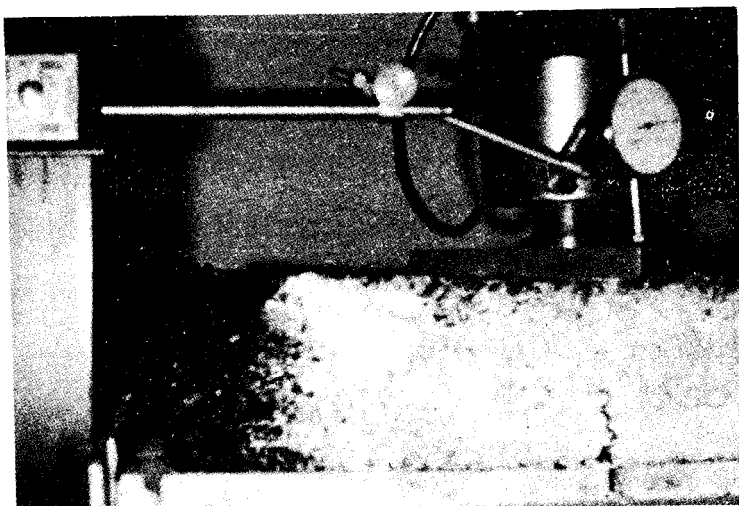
Reflection crack unreinforced asphaltic beam (after Venkatappa Rao et al. 1991a)
